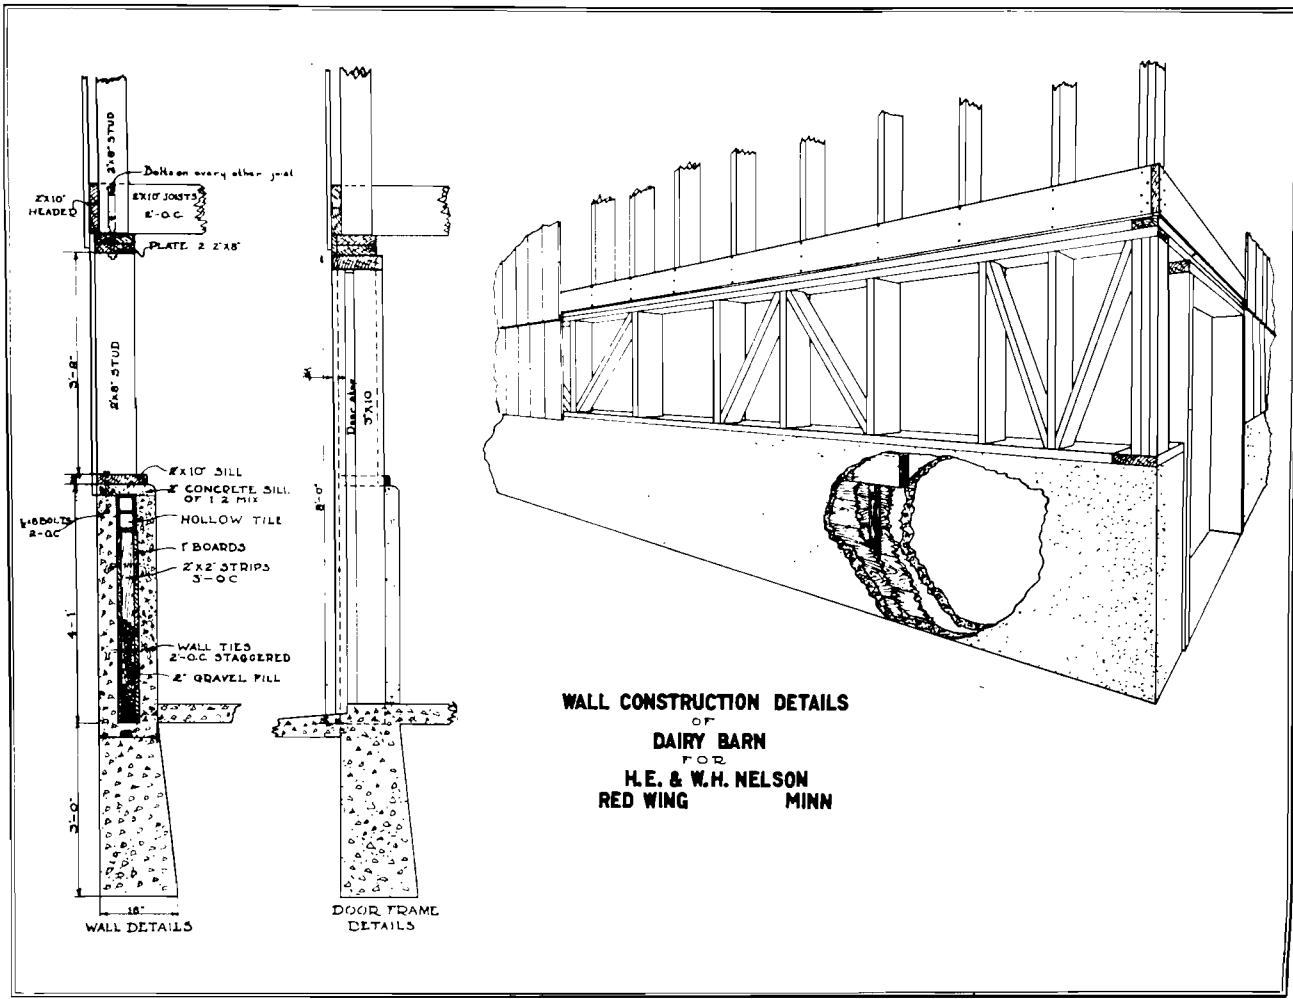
Details of insulated wall construction in the Nelson brothers' barn. Note the use of hollow tile instead of solid concrete at top of the wall section.
